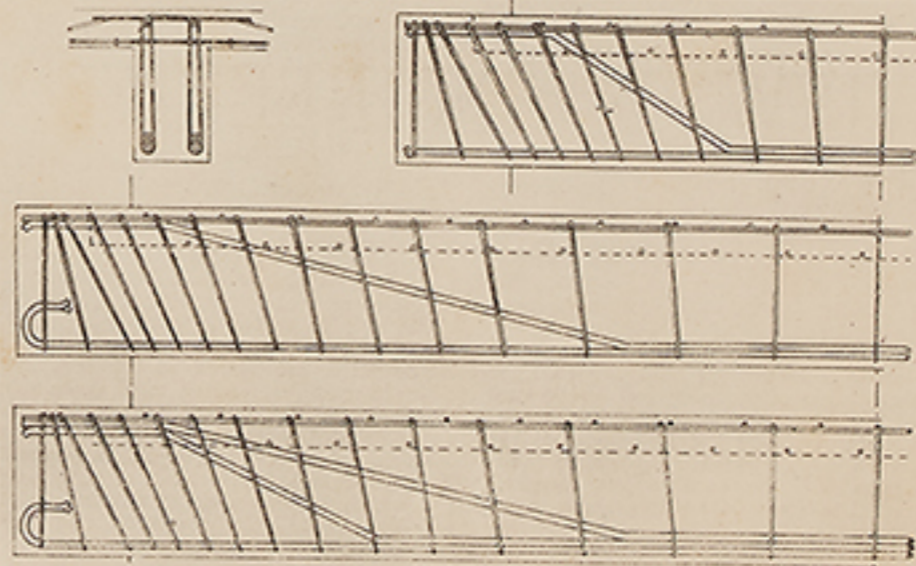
Piketty System, Reinforcement in Beams with Built-in Ends.
